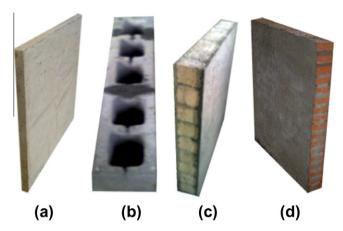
Materials used for thermal conductivity tests: (a) panel wall of ferrocement, (b) panel wall of hollow concrete block, (c) panel wall of lightweight concrete brick, and (d) panel wall of red clay brick.
